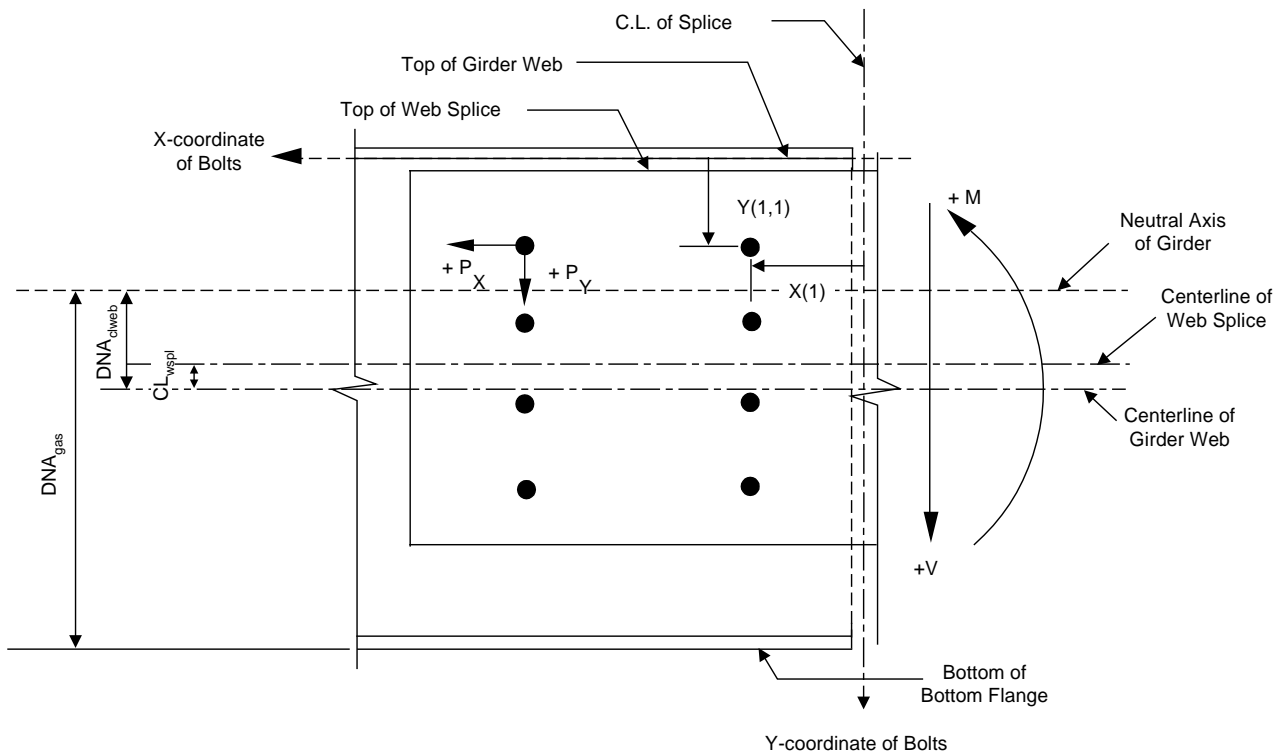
Adjacent Girder Section on Left Side of Splice Centerline and Sign Convention
